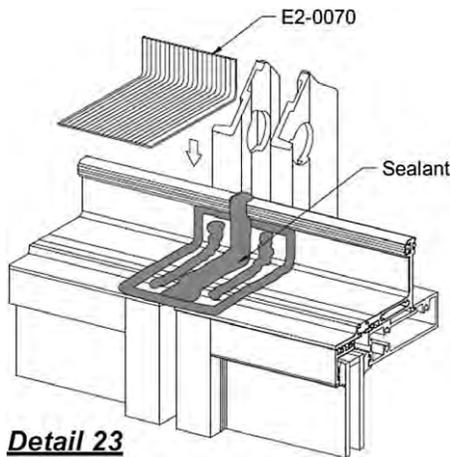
Detail of YCU 750 TU unitized curtain wall system
